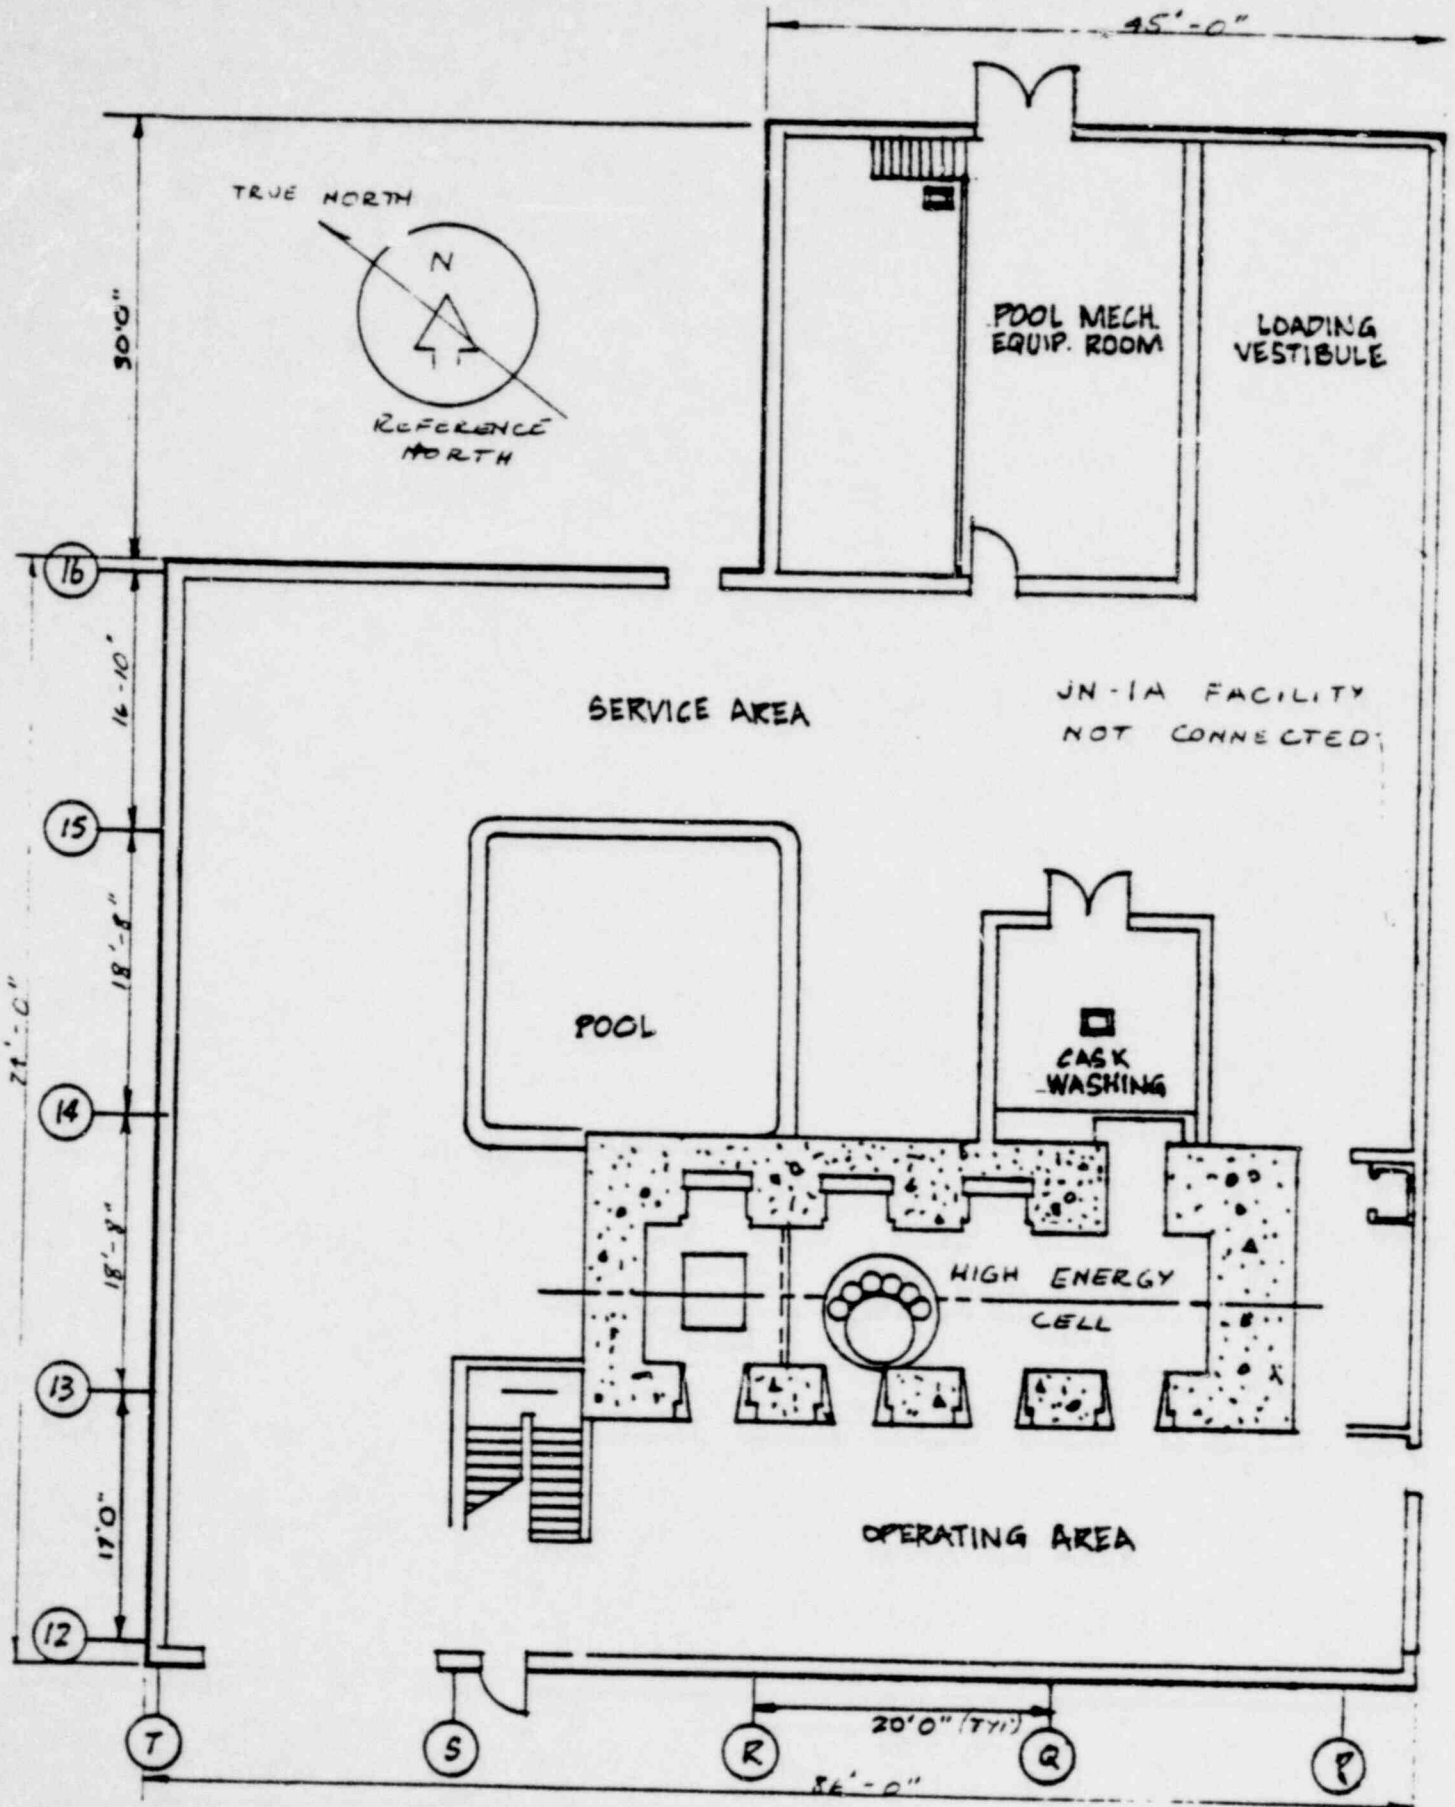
JN-1B HIGH ENERGY CELL FACILITY FLOOR PLAN
